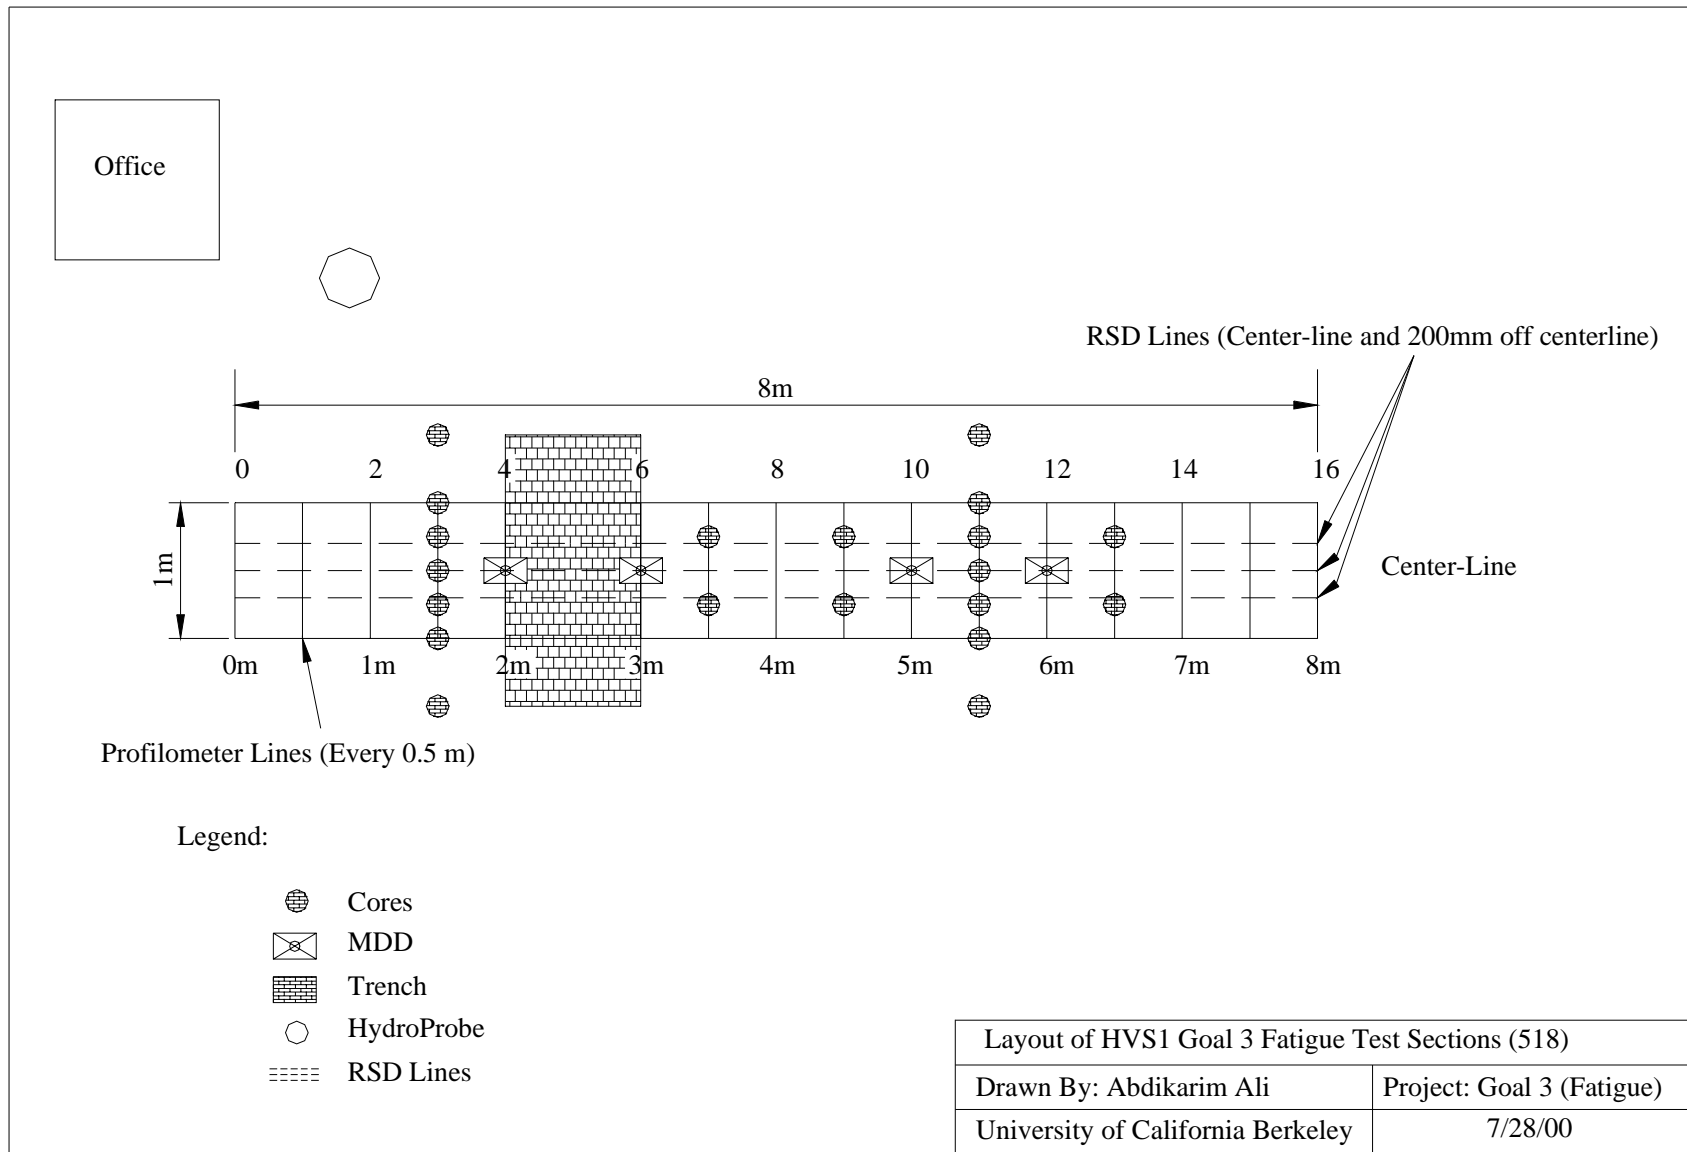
Locations of instrumentation, data collection points, and trenches and cores on Section 518 (undrained, ARHM-GG overlay).
